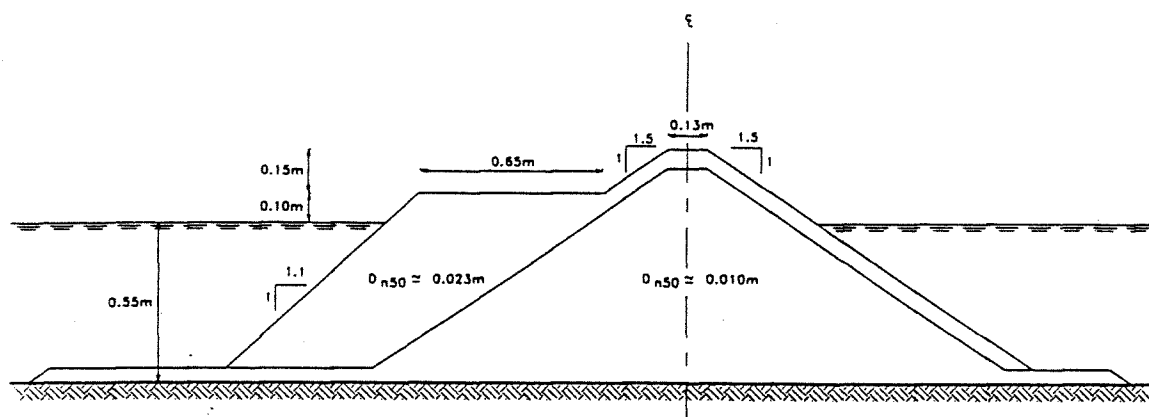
Berm breakwater cross-section used in the detailed three-dimensional model tests.
